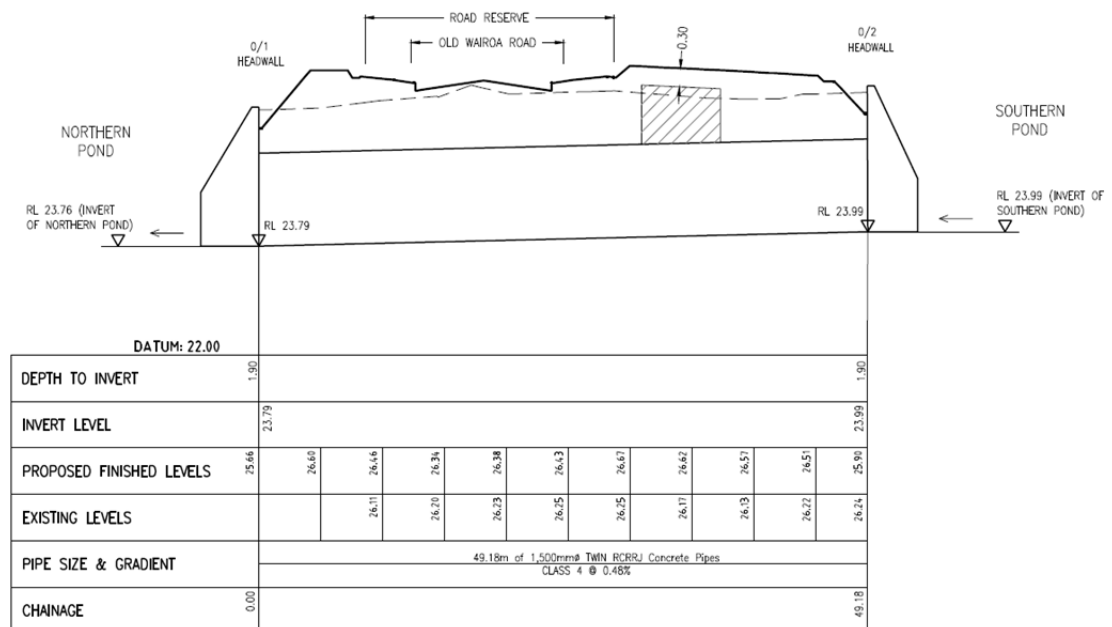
Old Wairoa Road Culvert longsection (MSC, October 2015)
